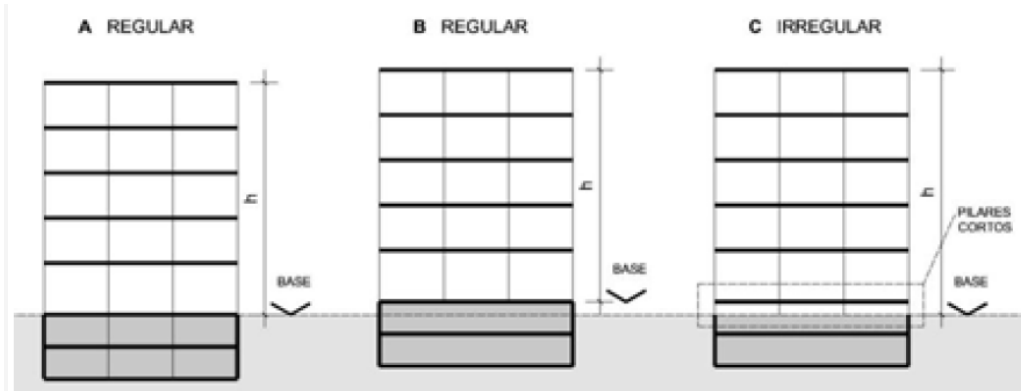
short pillars in the base of the building (Informe del Sismo de Lorca del 11 de Mayo de 2011)
